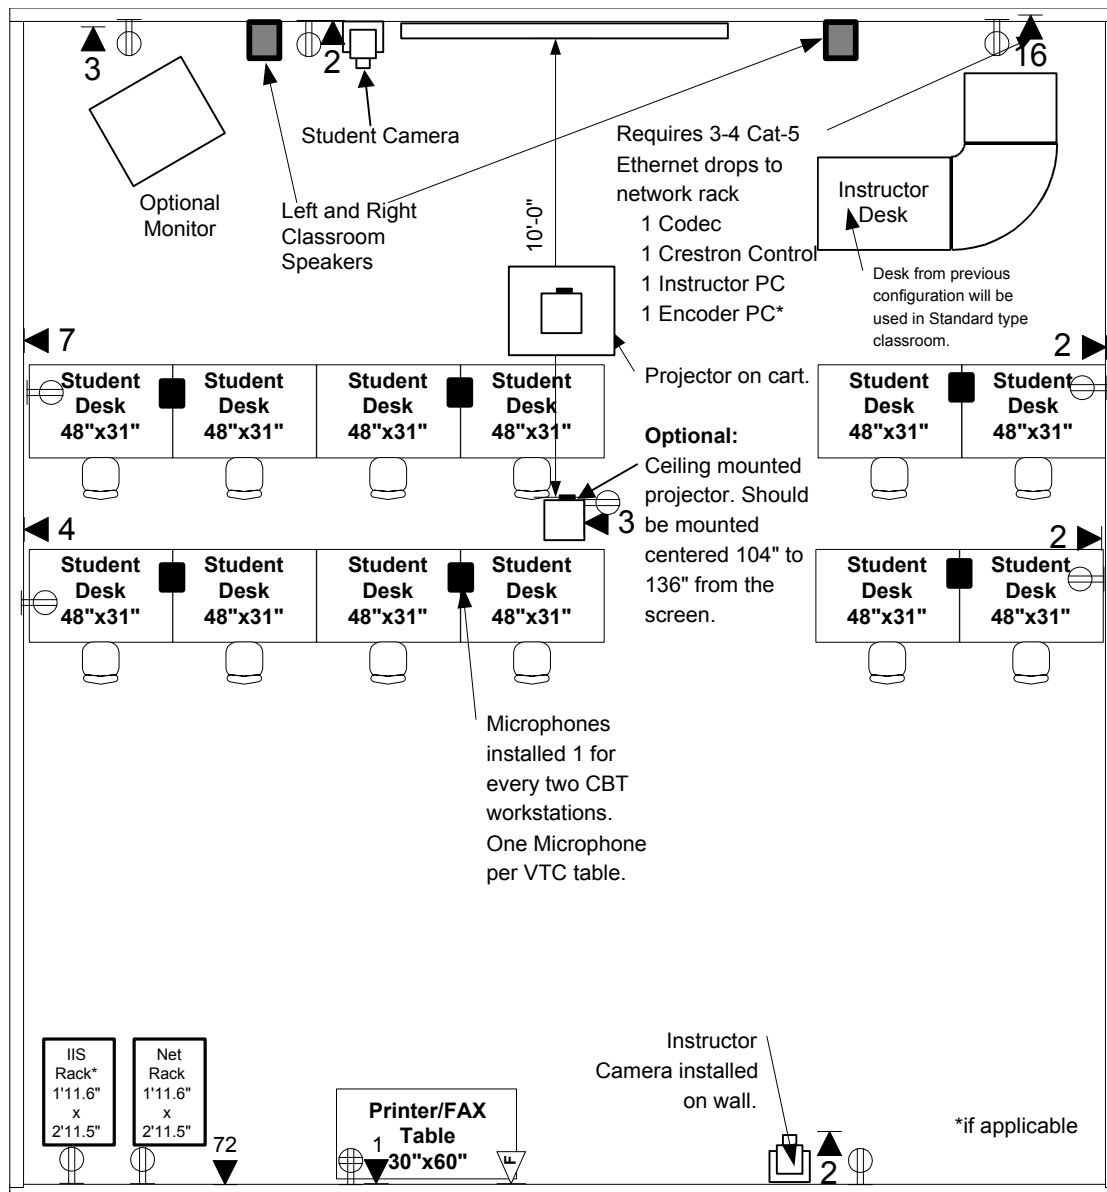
Typical Layout of MMS 600 Classroom with 12 Student Workstations
